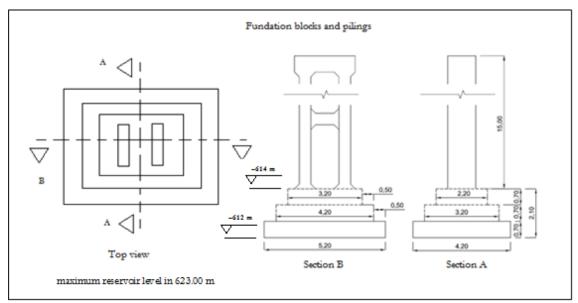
Dimensions of Foundation blocks and concrete columns.
